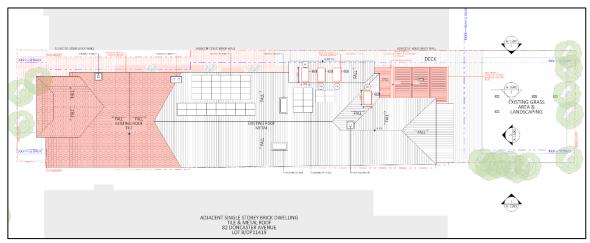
Extract of proposed Roof Plan (Source: B Studio).
